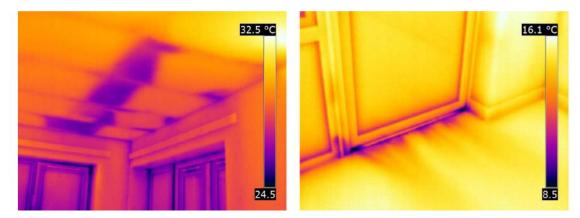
Construction flaws identified using thermography: on the left) an area of ceiling where insulation above was installed incorrectly; on the right) air leakage below a door cools the surface of the surrounding floor. (source: Taylor et al., 2013)
